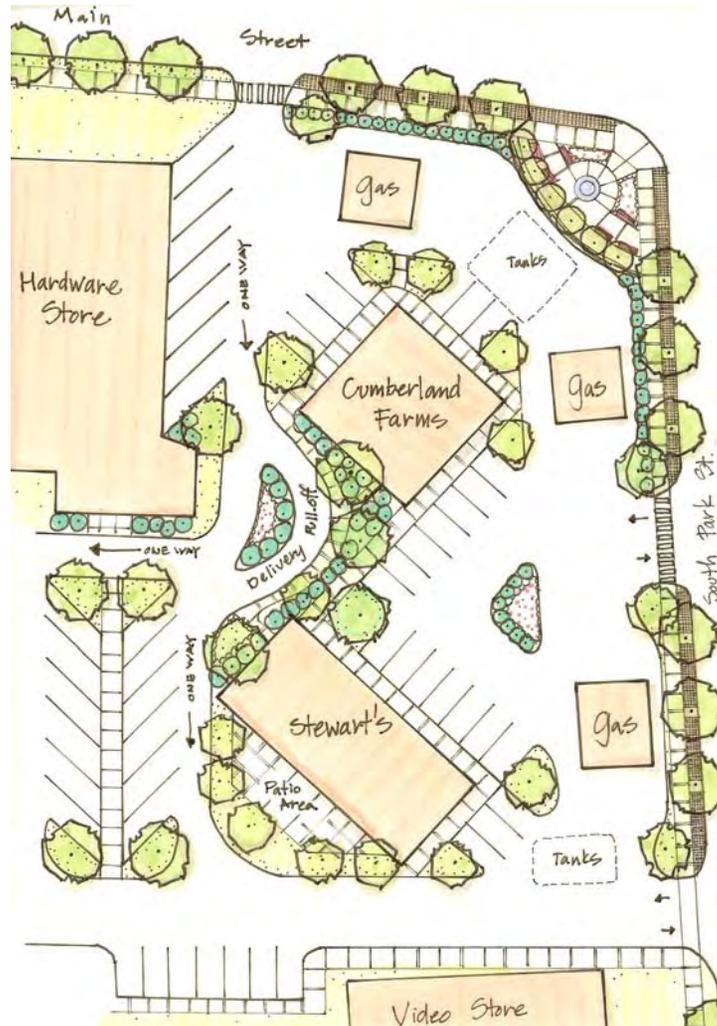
Site Plan for Cumberland Farms corner suggests access management, pedestrian improvements, combined parking and access; and new greenspace.
